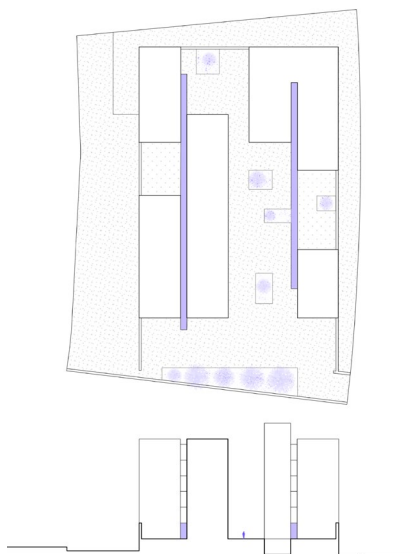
78-unit social housing project (Jacobo García-Germán). General courtyard and ground floor schemes (floor plan and section) of common spaces
